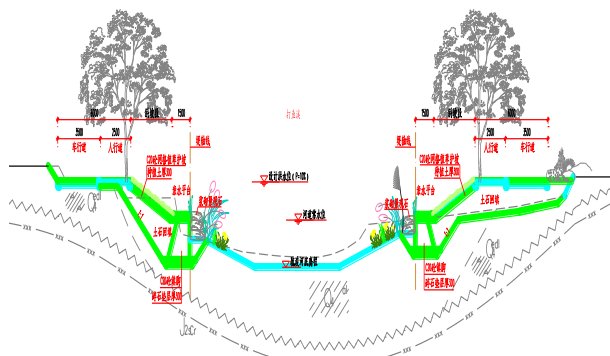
Proposed Cross Section of Dayu Stream (Dianjiang)
